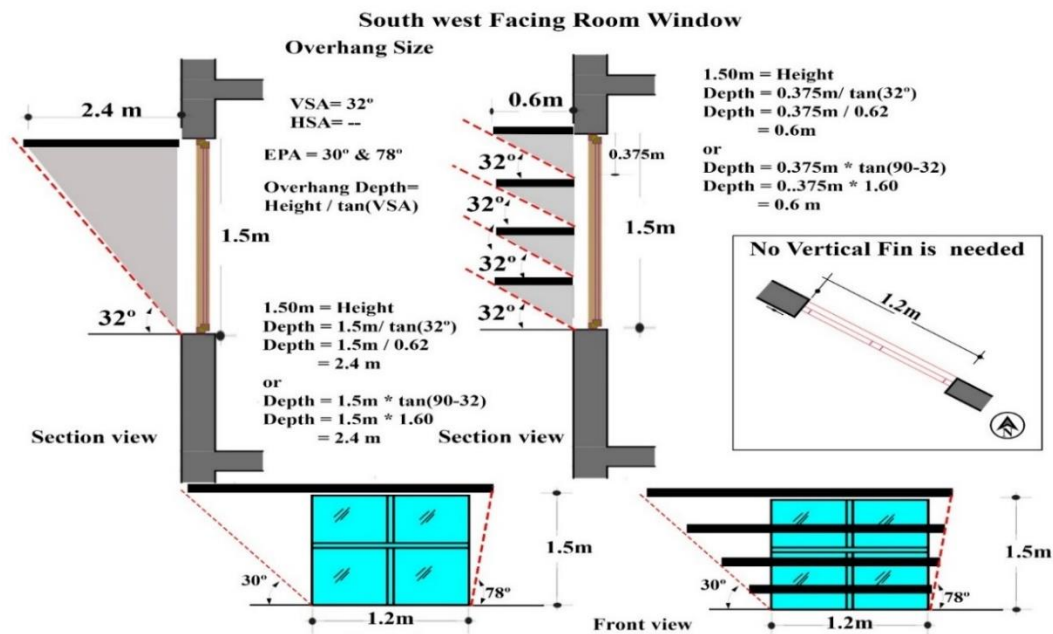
34: Calculation of southwest facing window overhang and fin size (Source: Author)
